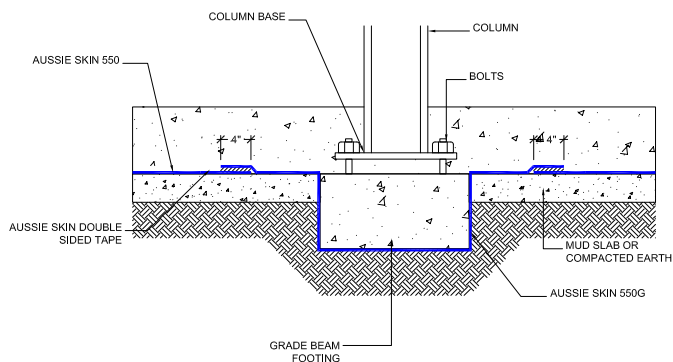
WRAPPED GRADE BEAM HYDROSTATIC
